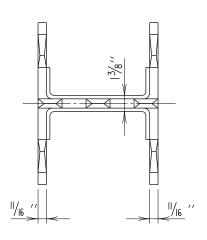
DETAILS FOR CAST-IN-PLACE CONCRETE PILES
